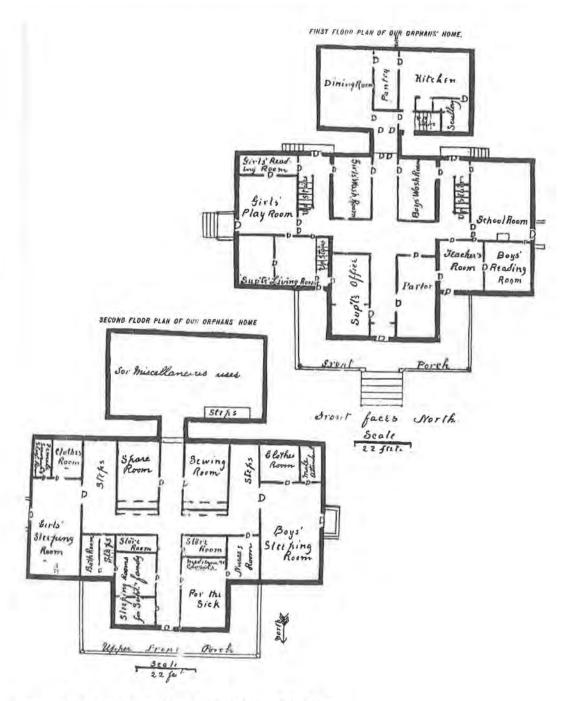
Original Floor Plan 1897-1908, A Gift of Love
